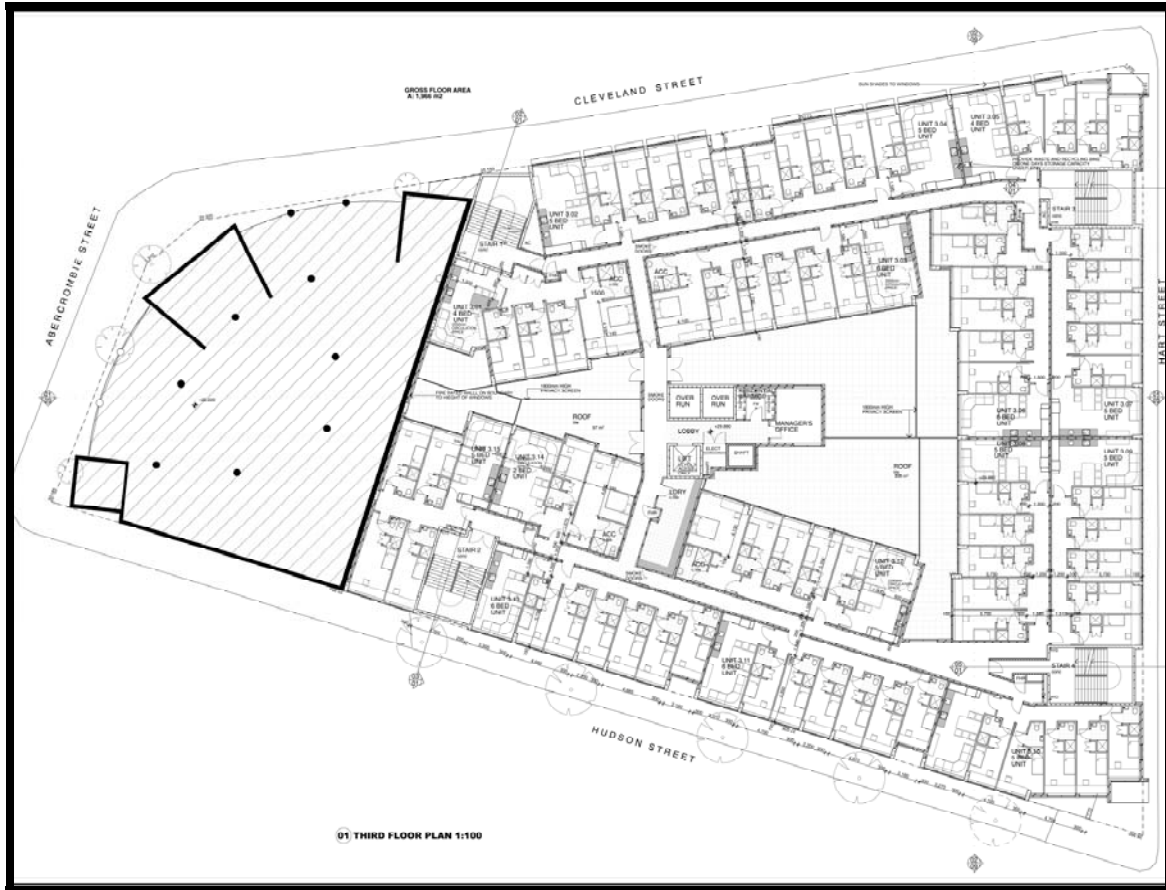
Third floor plan of proposed development (not to scale). (Source: Fortey + Grant Architecture, 2010)
